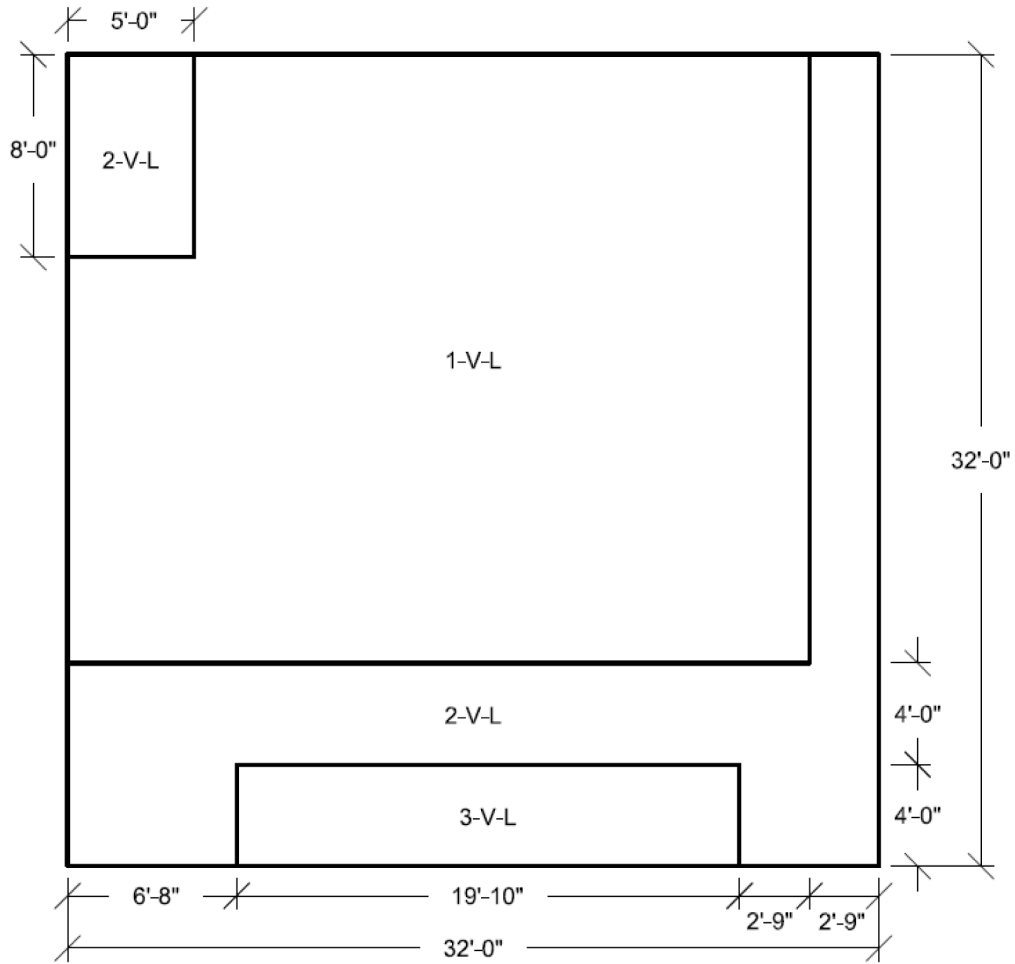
H.6-191 DGFOSV Wall 13 Looking From Outside Vertical Reinforcement Zones Near Side Face
